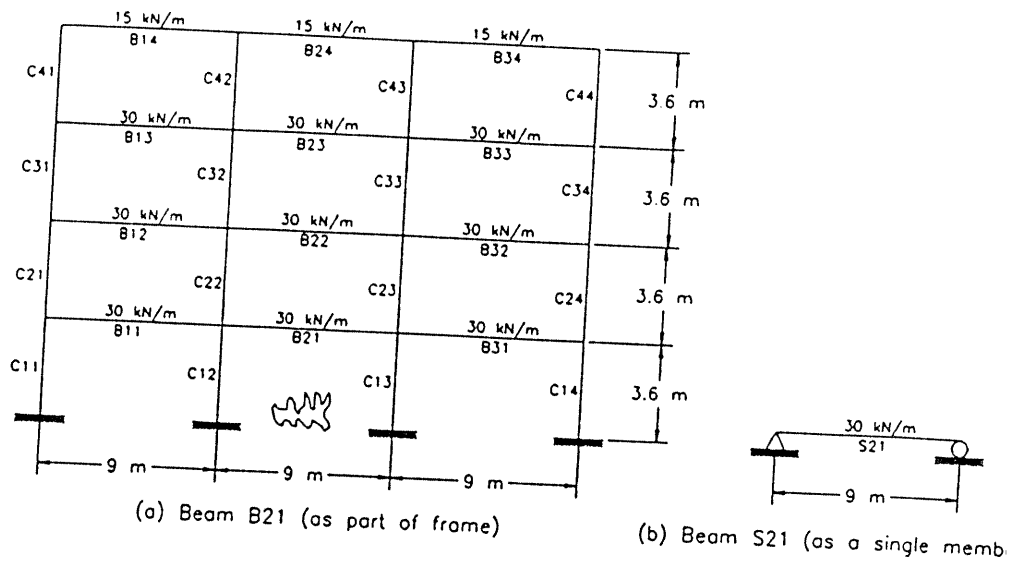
Frame and single beam dimension and loading (sections in Table 1).
